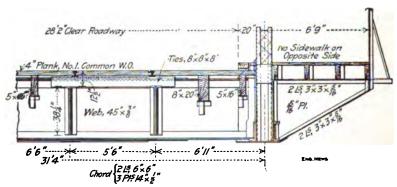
TIMBER FLOOR, 23RD STREET VIADUCT, DENVER, COLORADO.
